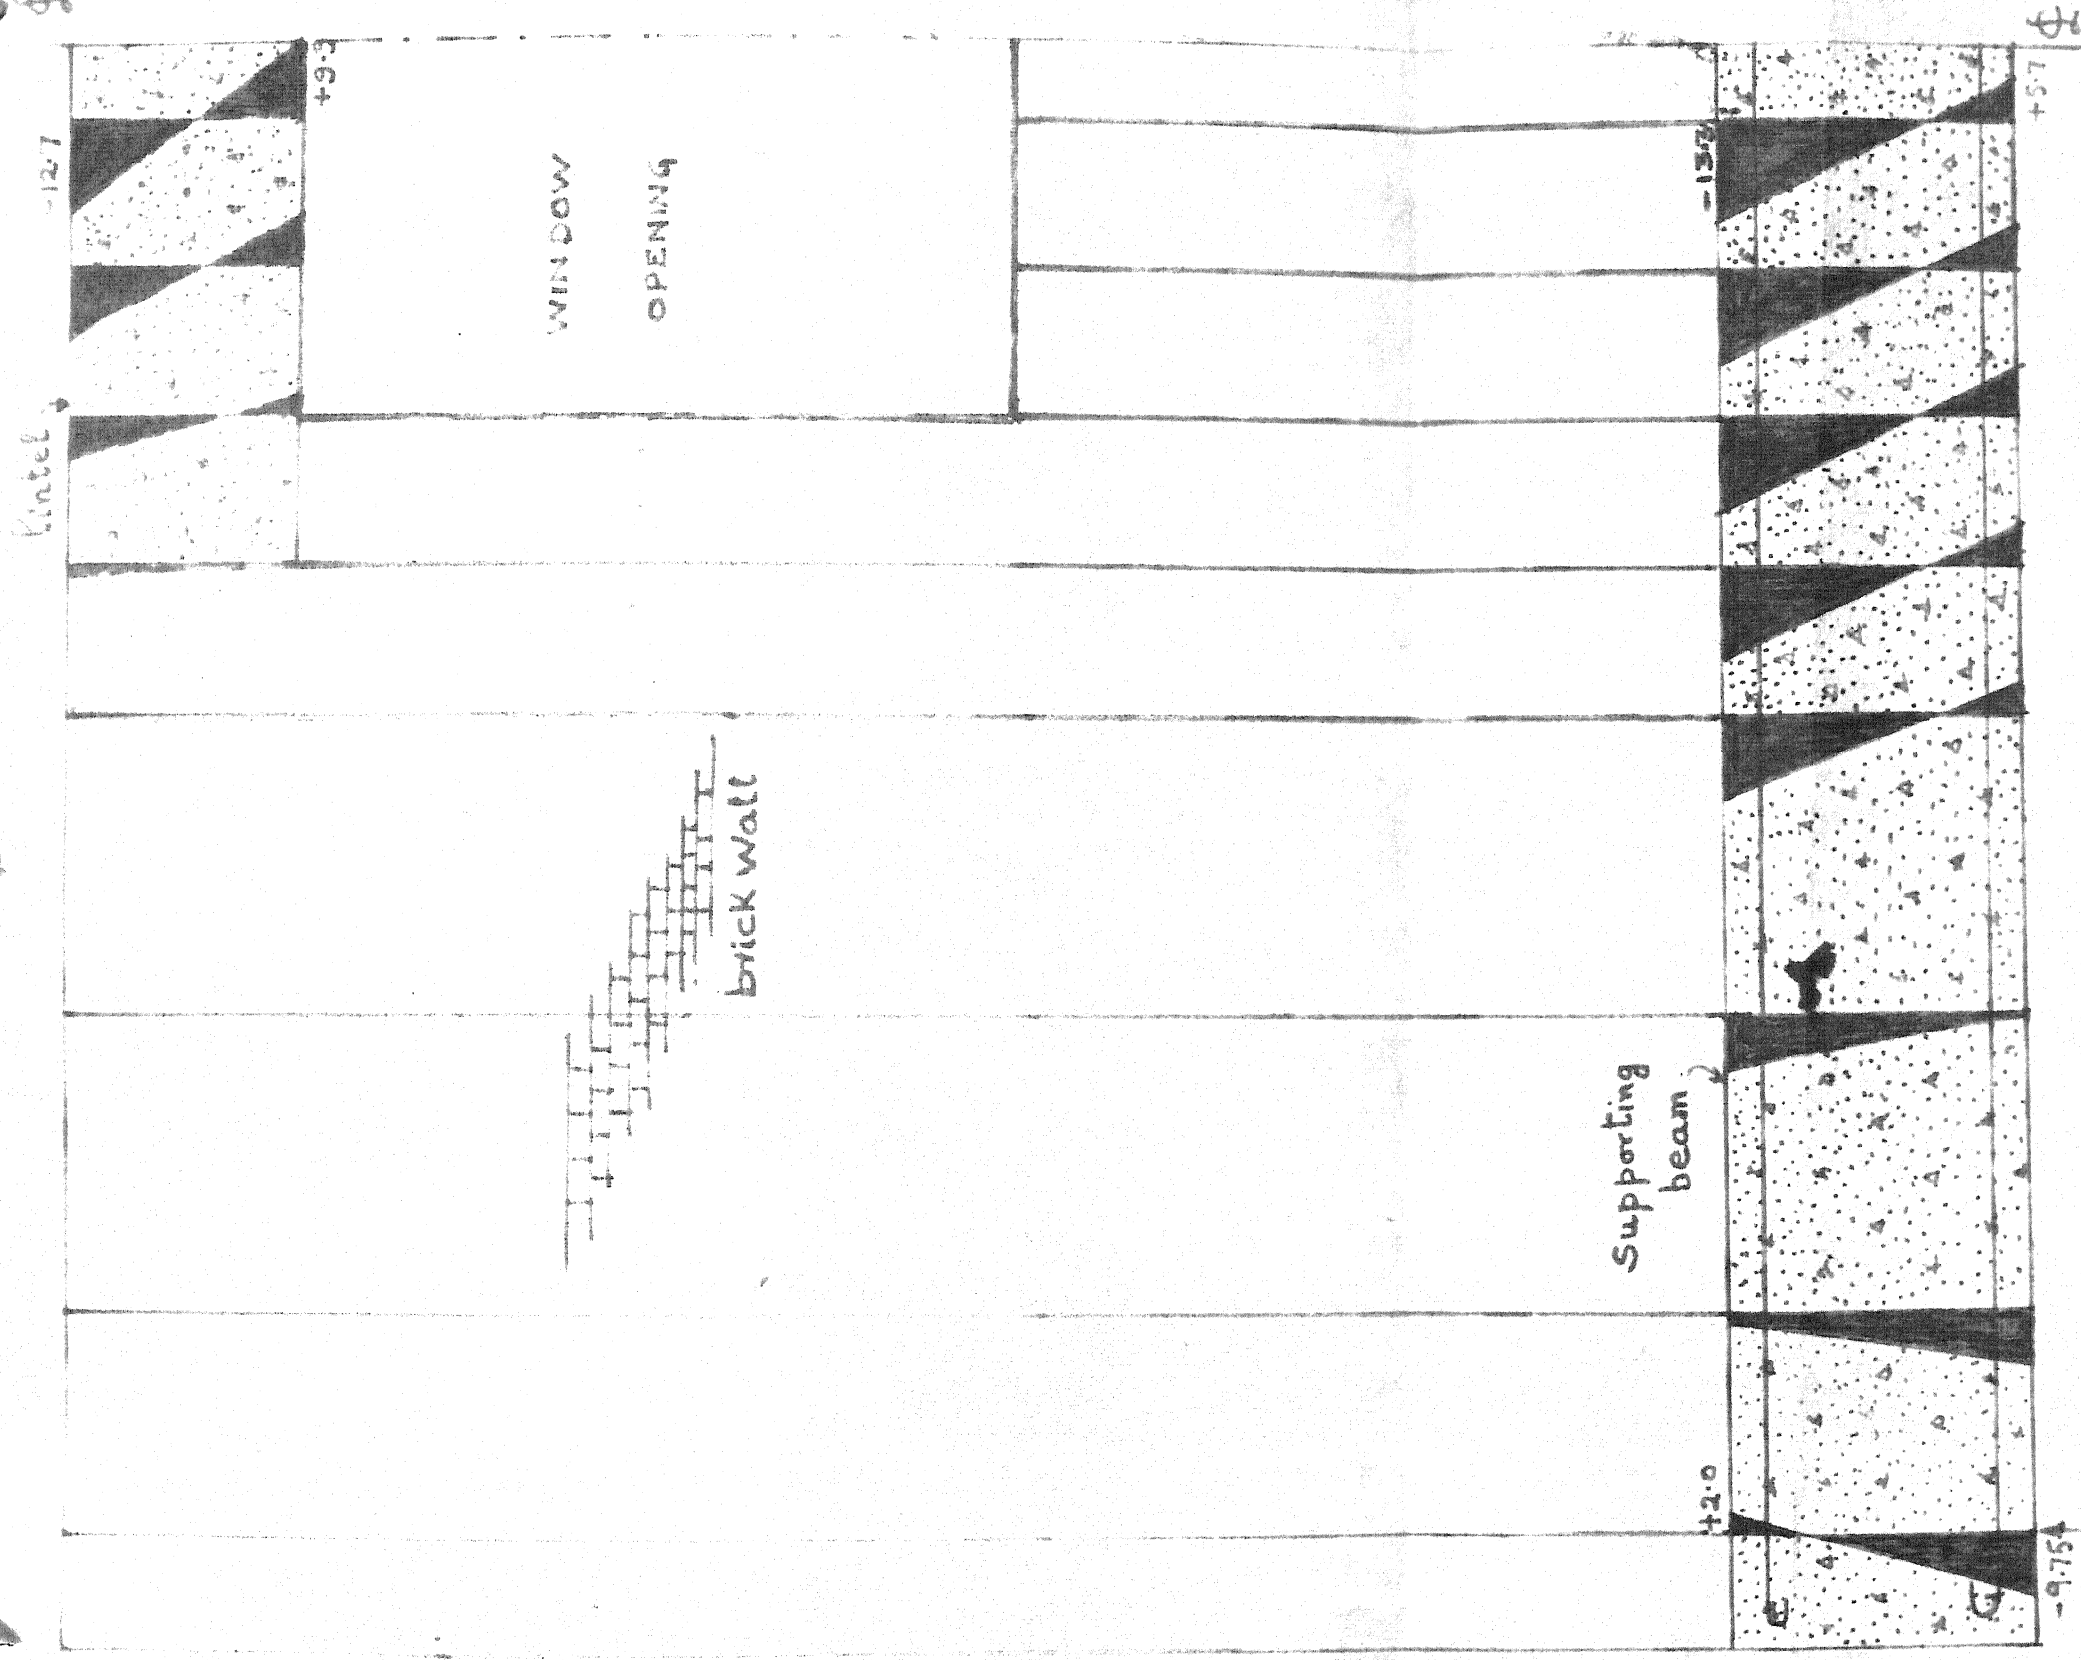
σ_x STRESSES IN WALLS WITH WINDOW OPENING
